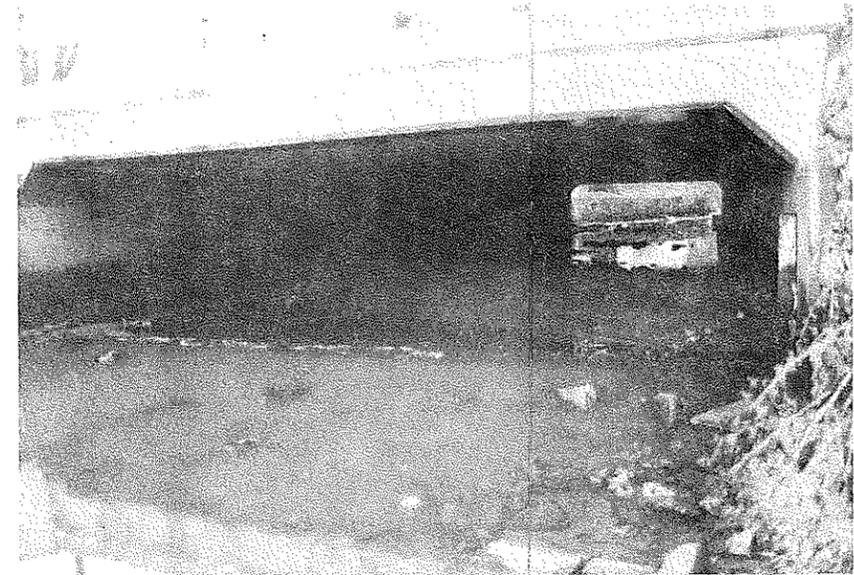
WEIR IN DRUMMOND STREET CULVERT
